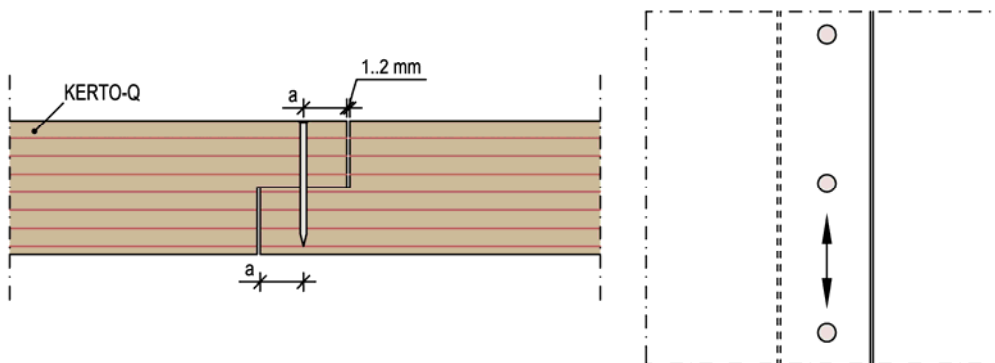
Joint with half lap, for minimum spacing see chapter 10.1.1.
